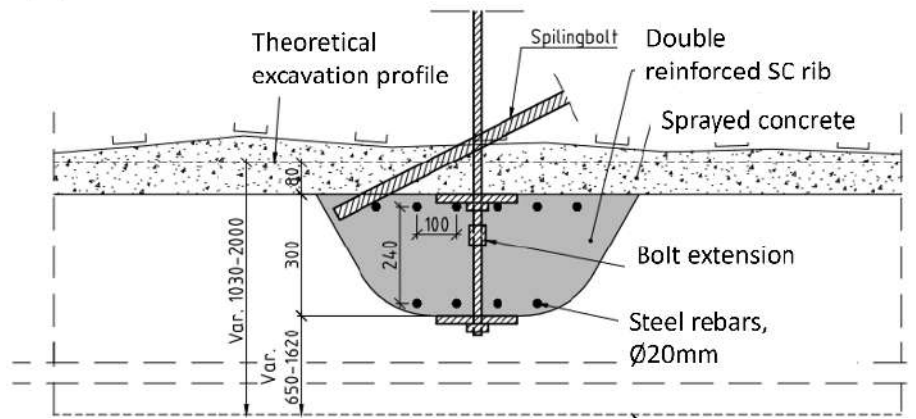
Reinforced ribs of sprayed concrete (RRS2) combined with pipe umbrella support used in the weak ground section
